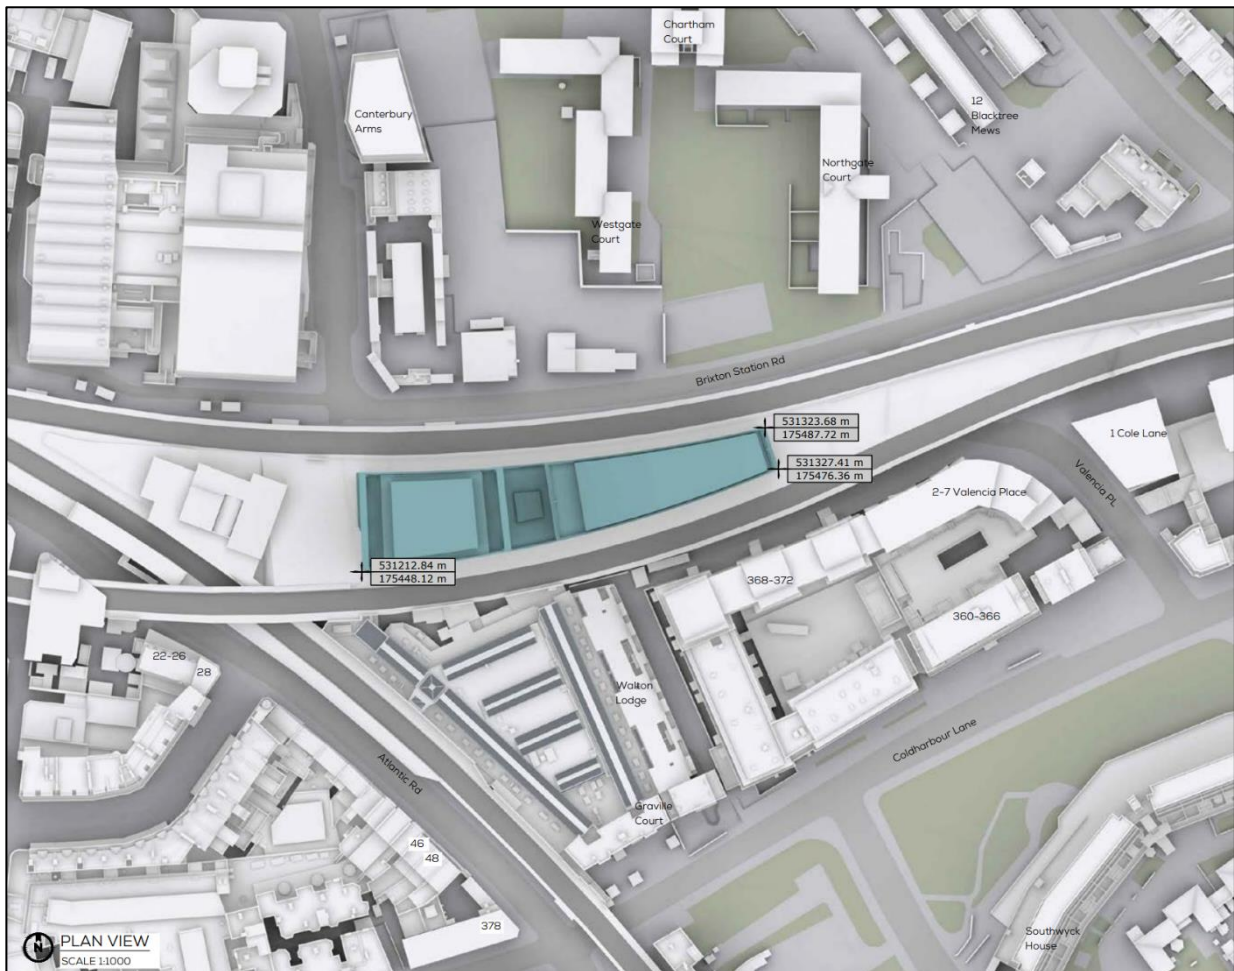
Neighbouring properties in relation to the application site (application site shown in teal)
